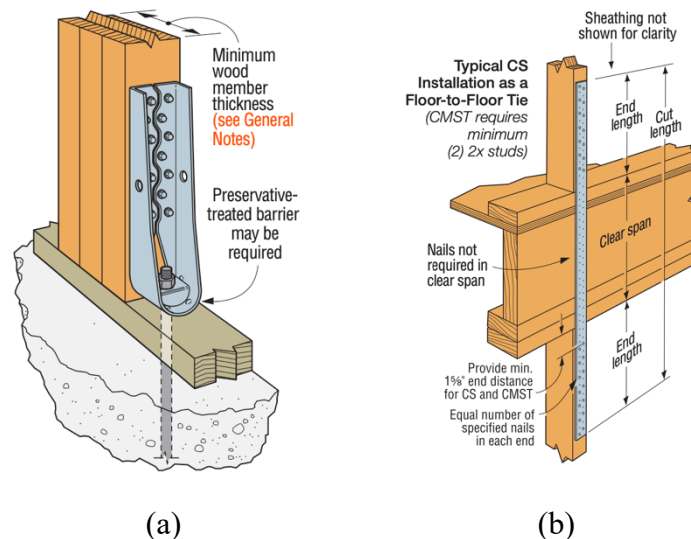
Example a) Holdown and b) Strap for Connection Strengthening [24]
